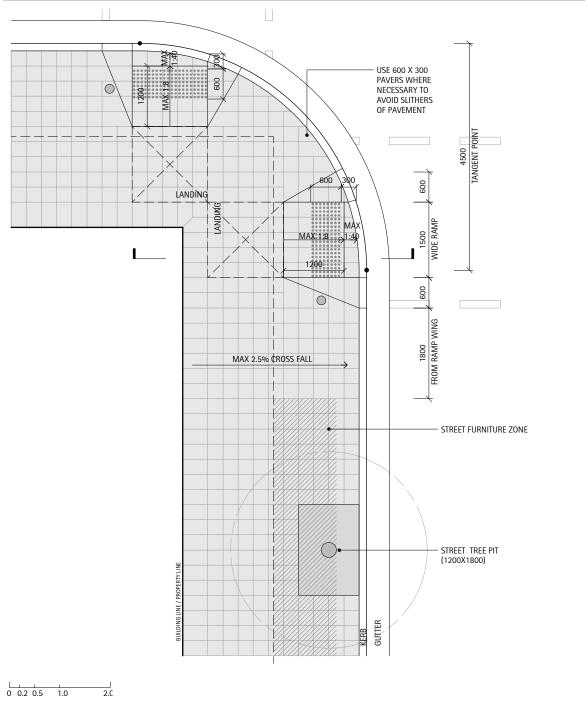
Streets Corner Plan: 4500 Radius 1500 Ramp
